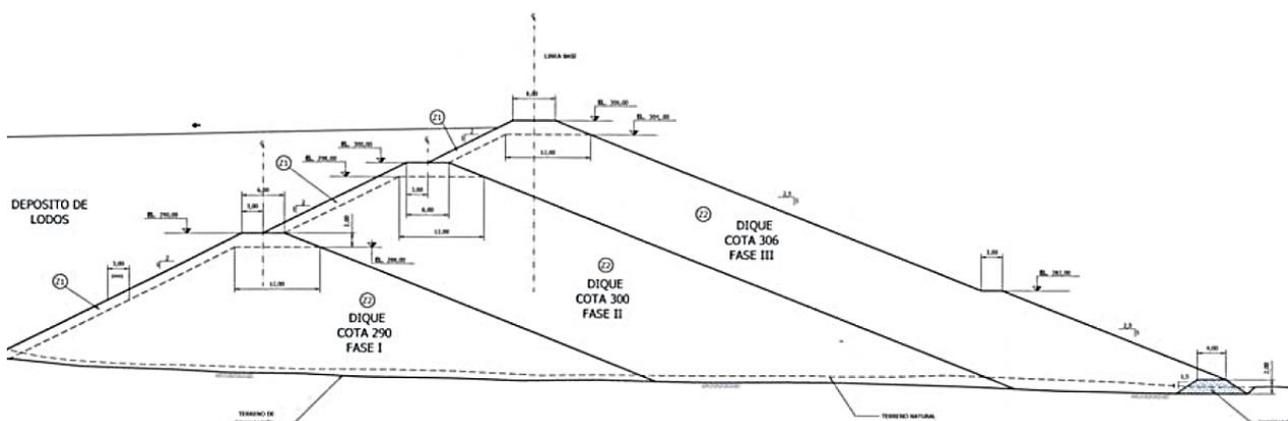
Transverse section of the Minas Teñidas tailings dam (source: Martínez-Santamaría et al. 2008)
